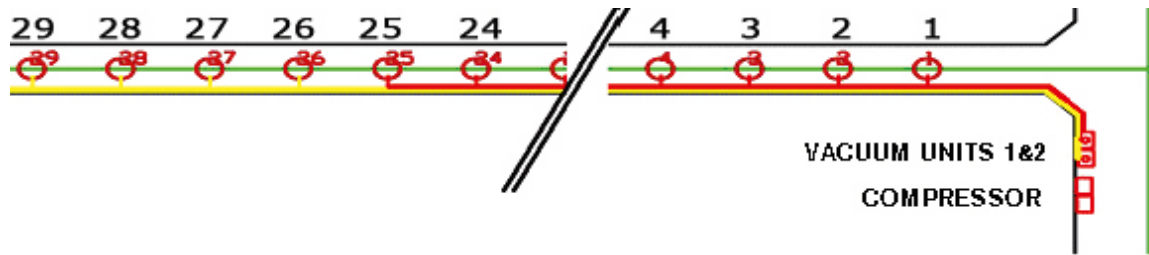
Schematic drawing of the drainage system in a tunnel with 50 deposition holes.
